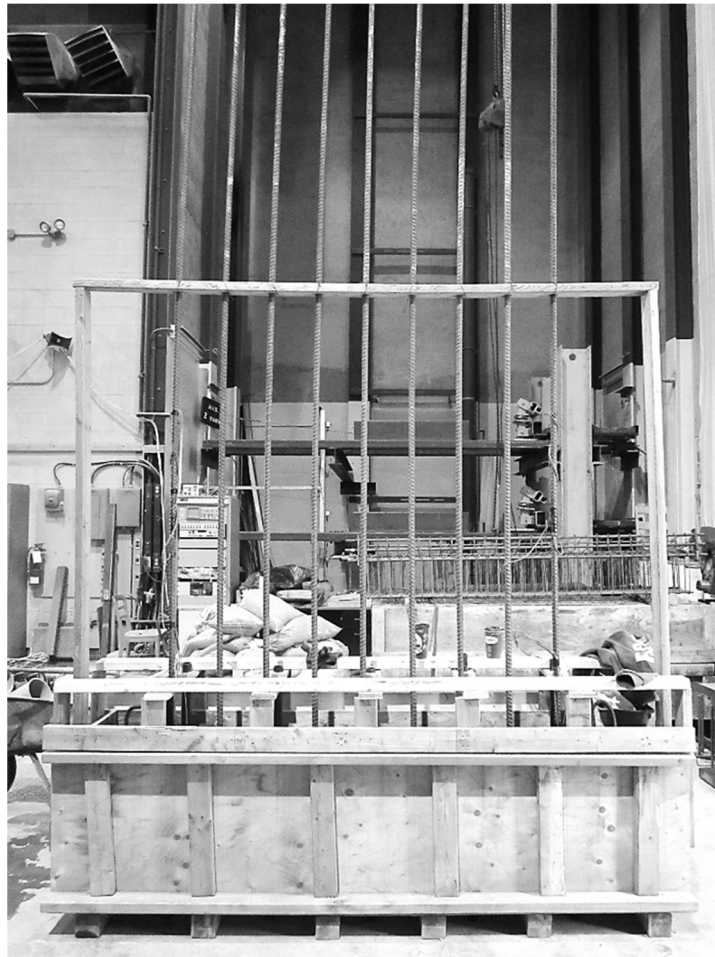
Base Beam Formwork with Support for Vertical Wall Reinforcement
